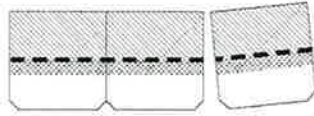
Shadow Ridge accessory shingles detach easily from three-piece units to make 72 individual cap pieces.
